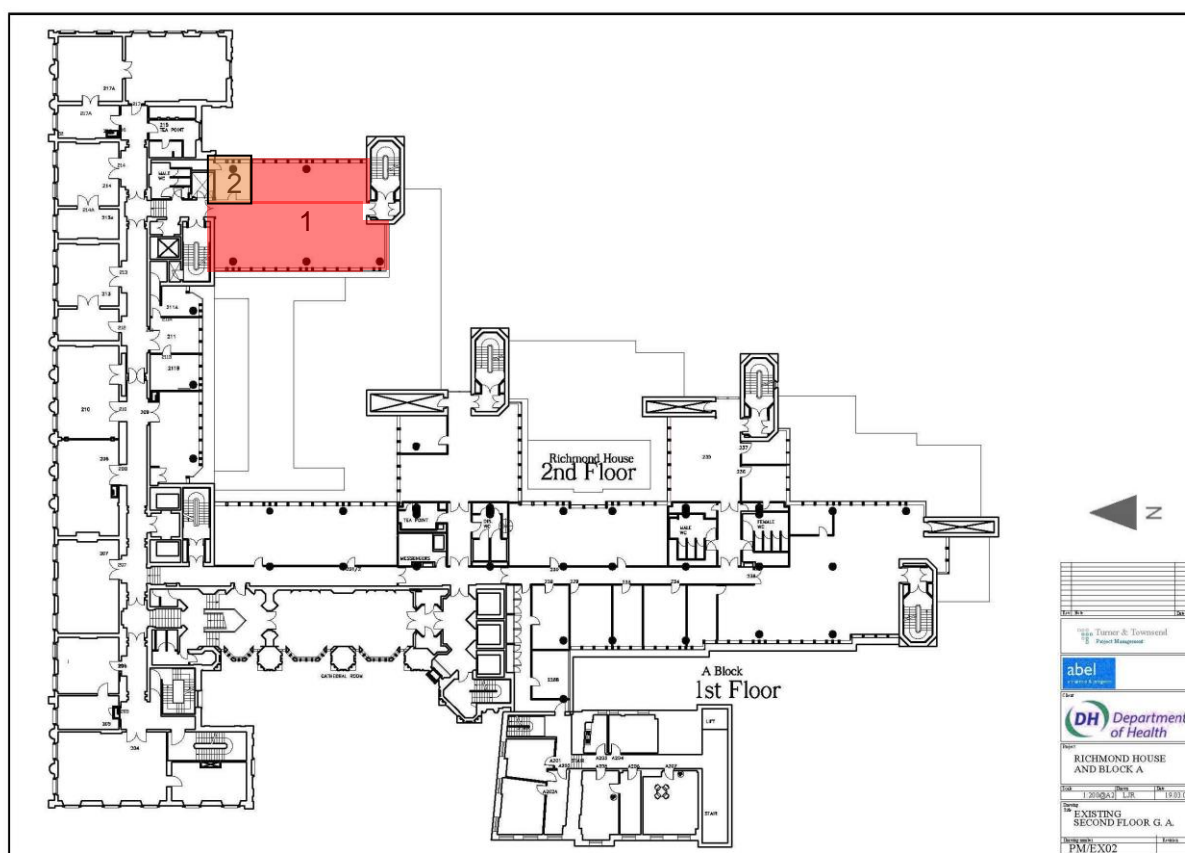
Floor Plan of Second Floor with study area highlighted in red
